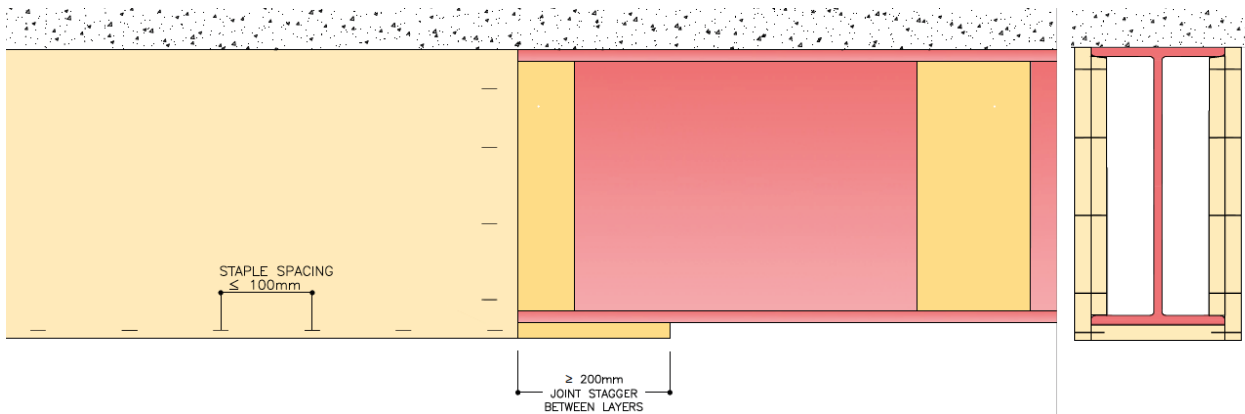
Elevation and cross-section view of Universal Steel Beam, showing fixing of Knauf Fireboard to underside of Universal Steel Beam
